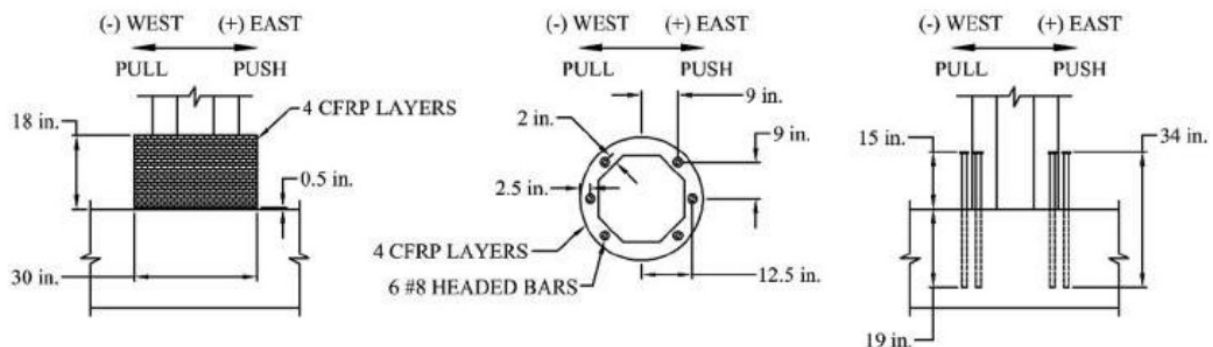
Repair design of column (Parks et al. 2016, p. 618)
